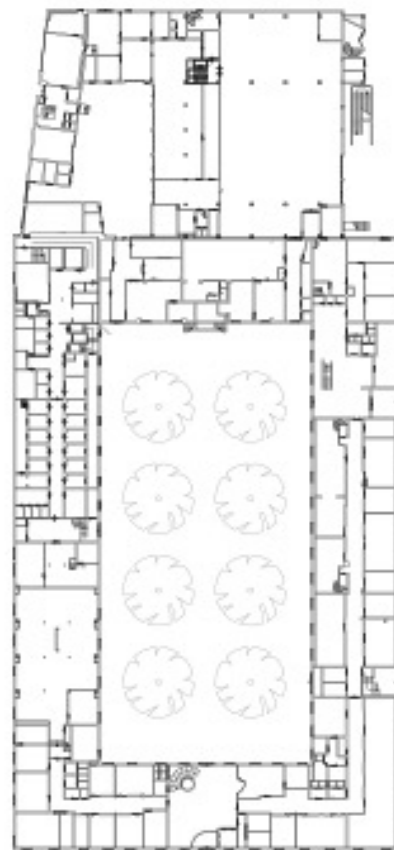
Koudenhorn ground floor Current situation, Noord Hollands Archief (1971)
